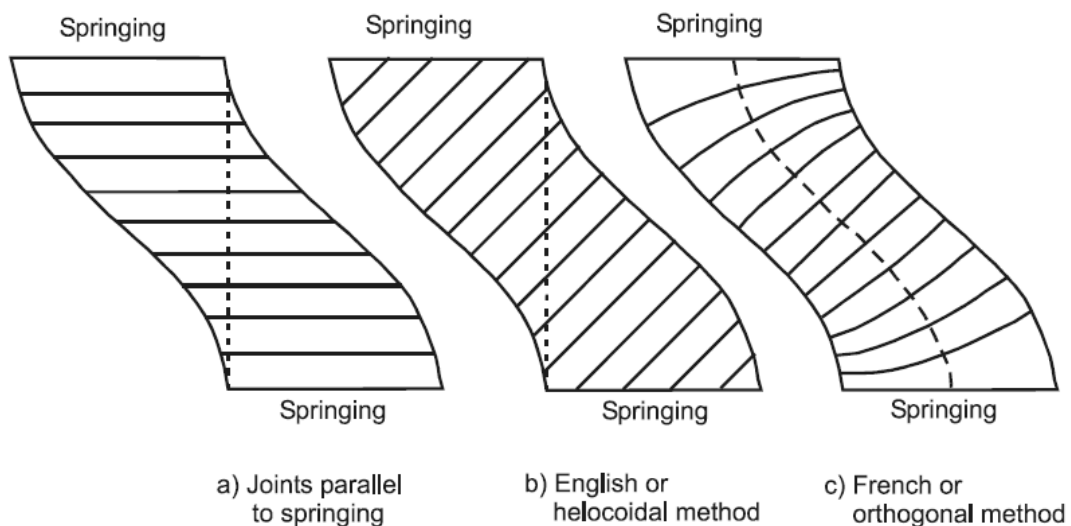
Skew bridge construction patterns (Melbourne & Hodgson, 1995)
